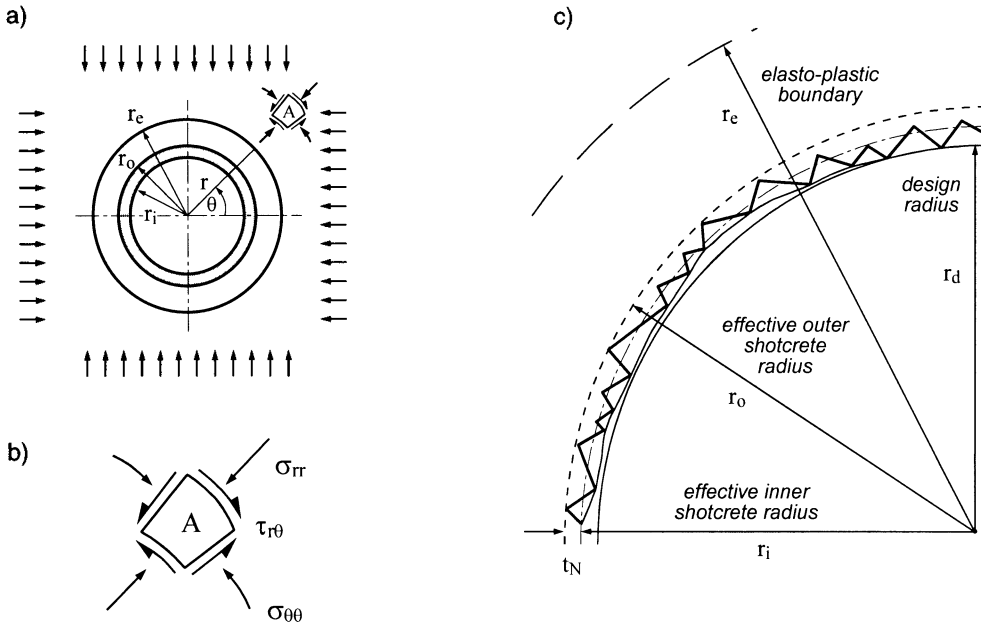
A rough cylindrical excavation undergoing elasto-plastic deformation. (a) A cross-section showing the equivalent shotcrete/rock annulus. (b) The stresses acting on an element of material. (c) Radii of the equivalent shotcrete/rock annulus.
